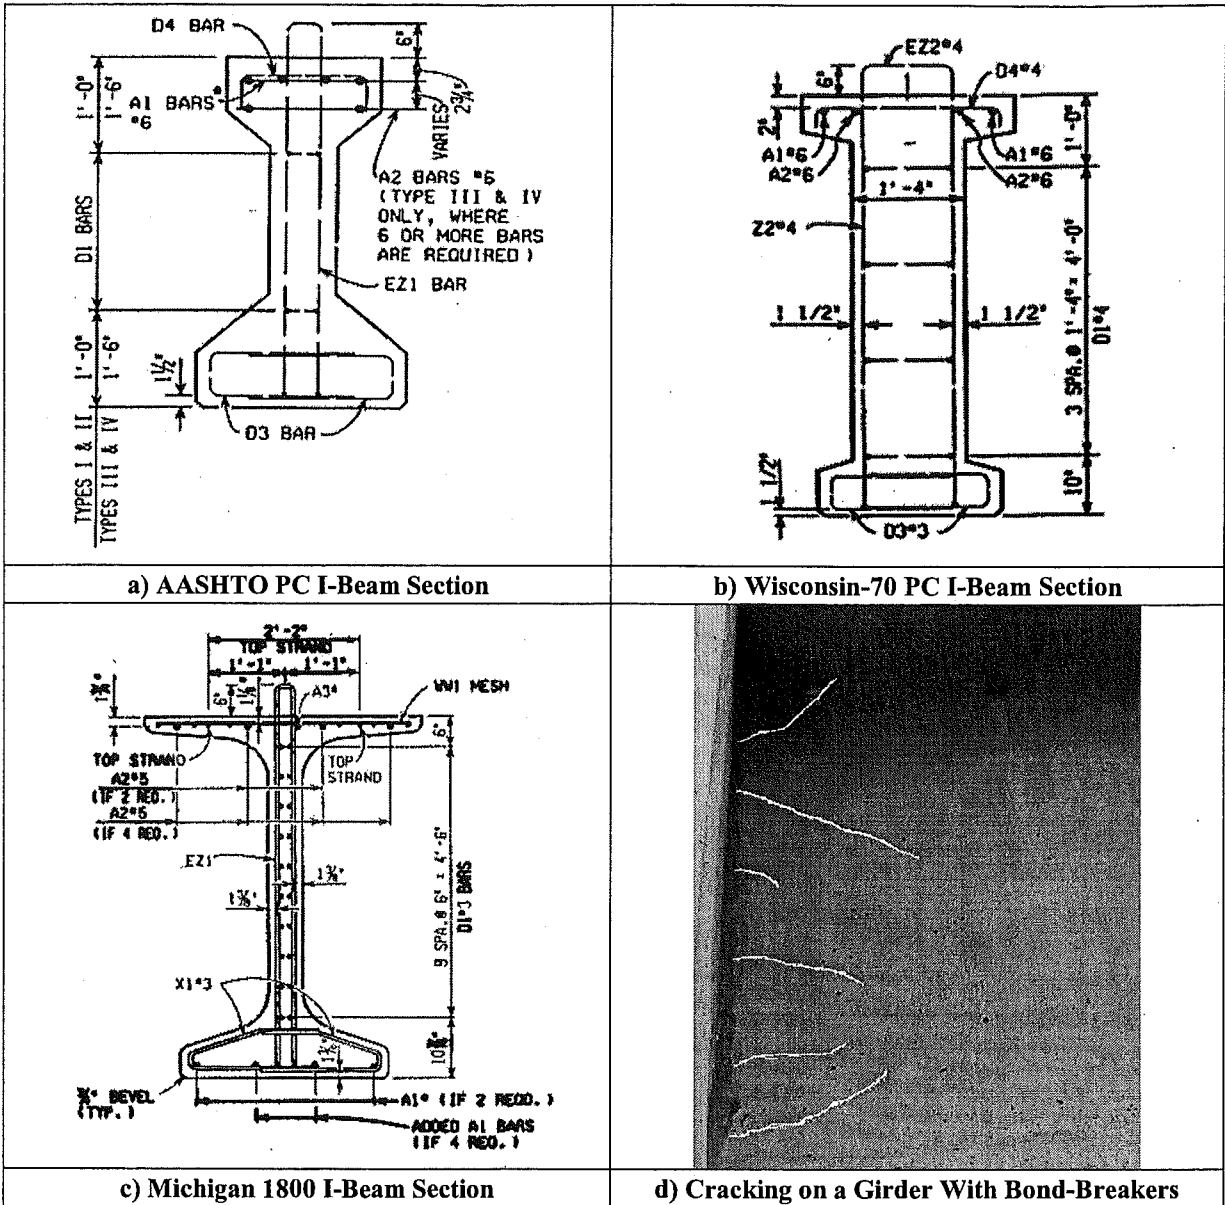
Shear Reinforcement used in Newly Manufactured Girders and Web Cracking Observed during Field Inspection on a PC I-Beam with Bond-Breakers
